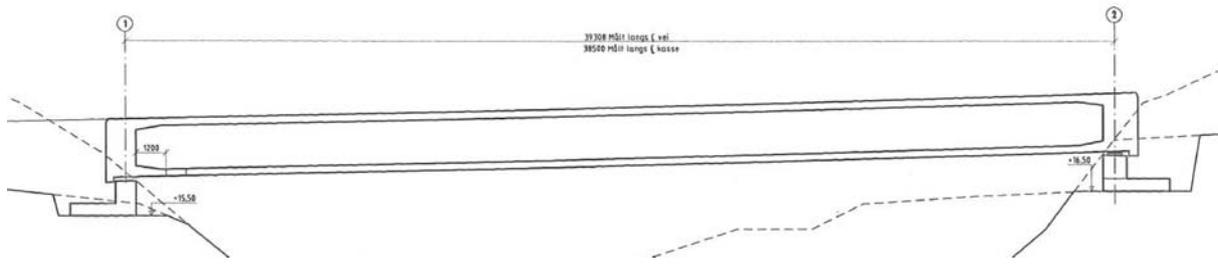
Hillersvika Concrete Box Girder Bridge has a bridge span of 39,3 m.
